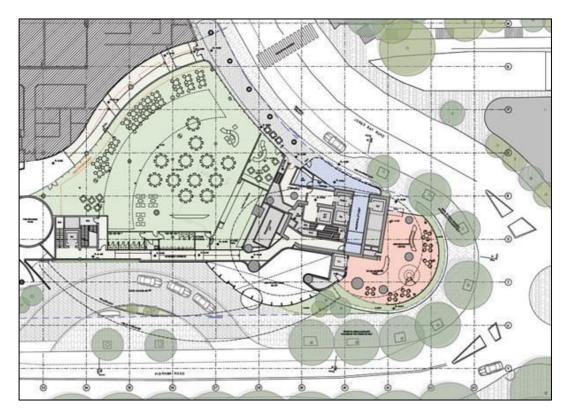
Level 00 Residential Entry Ground Floor Plan (FJMT Studio, Sheet No. AF2000)
